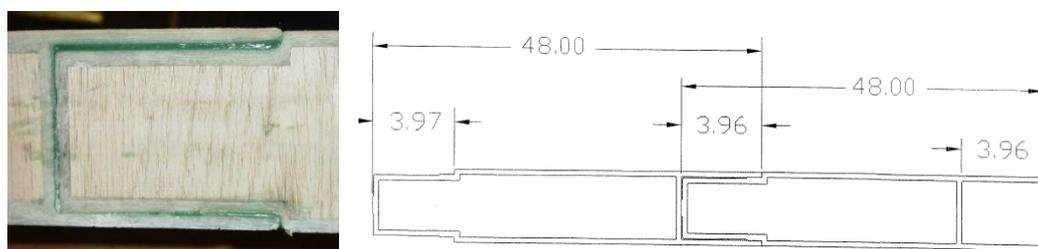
A double sided lap joint and schematic joining of two 4' wide modular panels (units in inches)
